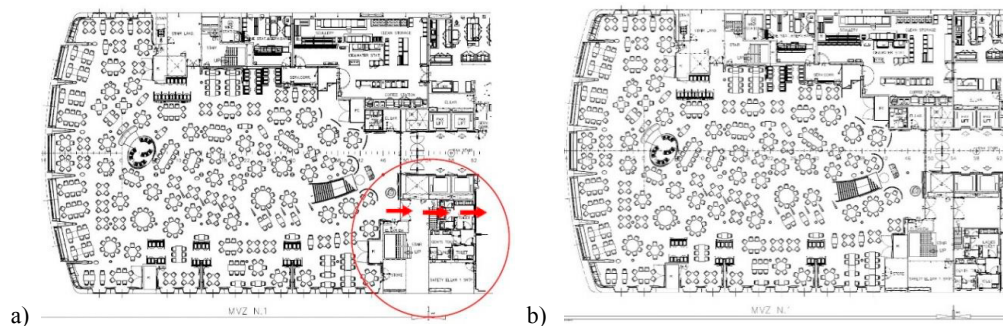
(a) The area identified to add a restaurant exit; (b) the alternative layout of a new design.
